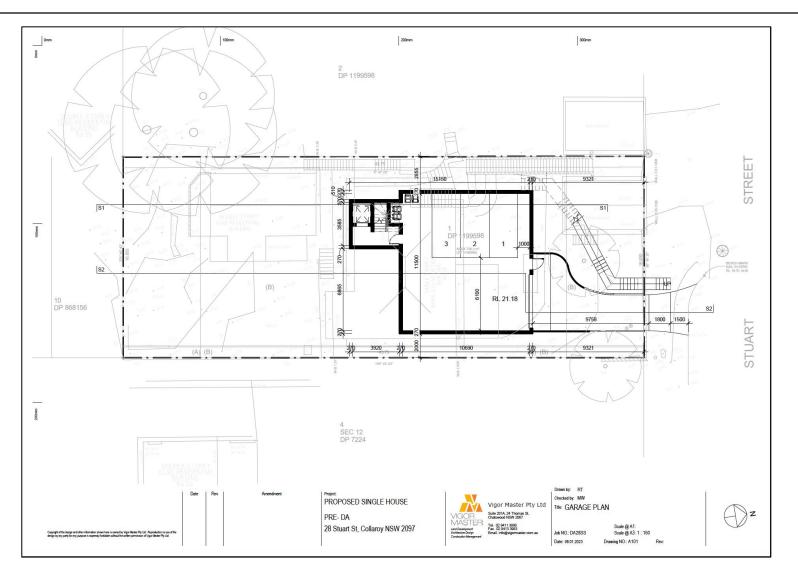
ILLUSTRATES PROPOSED GARAGE PLAN
